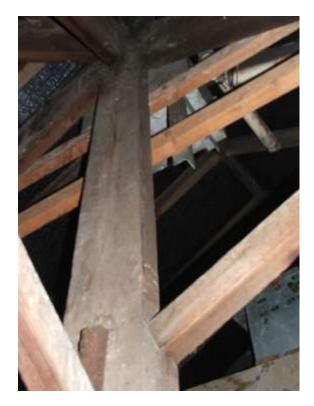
and Plate 10 No.1 Framwellgate Bridge - details of the king-post roof structure of the main range
